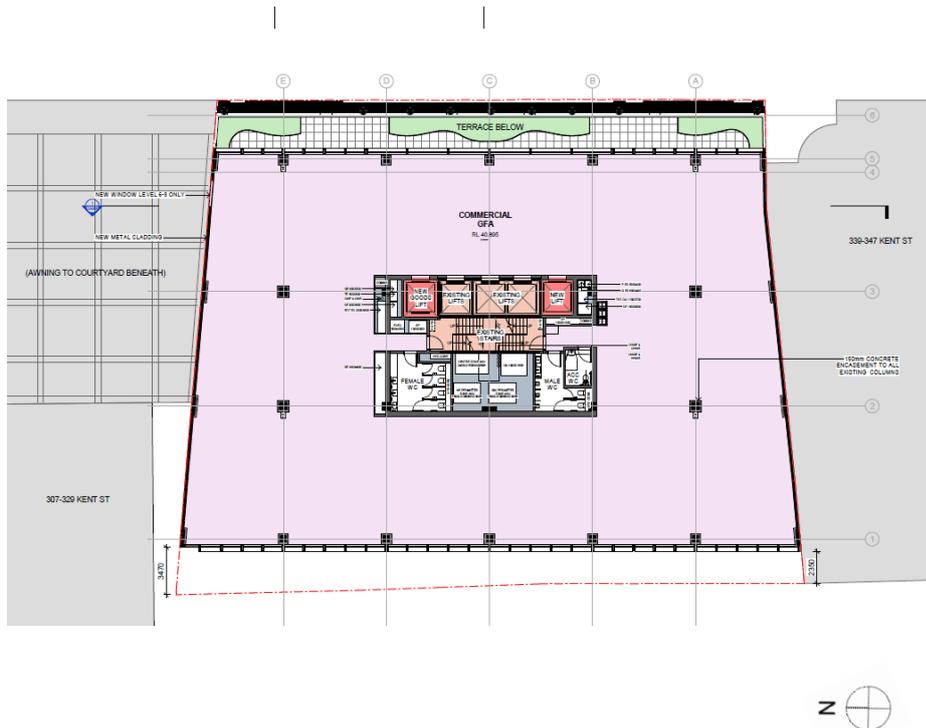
Floor plan of Levels 5-8 - nil setback to north and south
